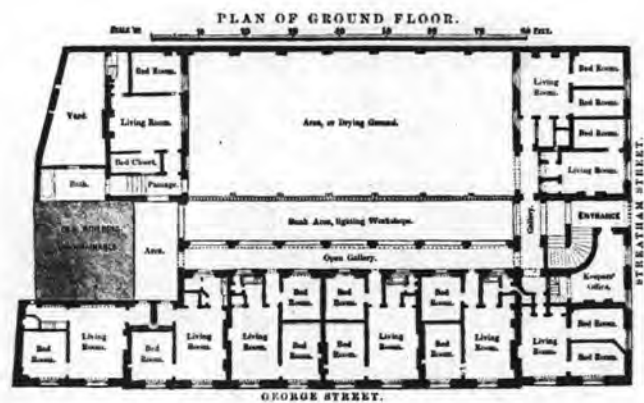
Roberts, Model Homes for Families, Streatham Street. Plan (*North American Review*, April 1852).
